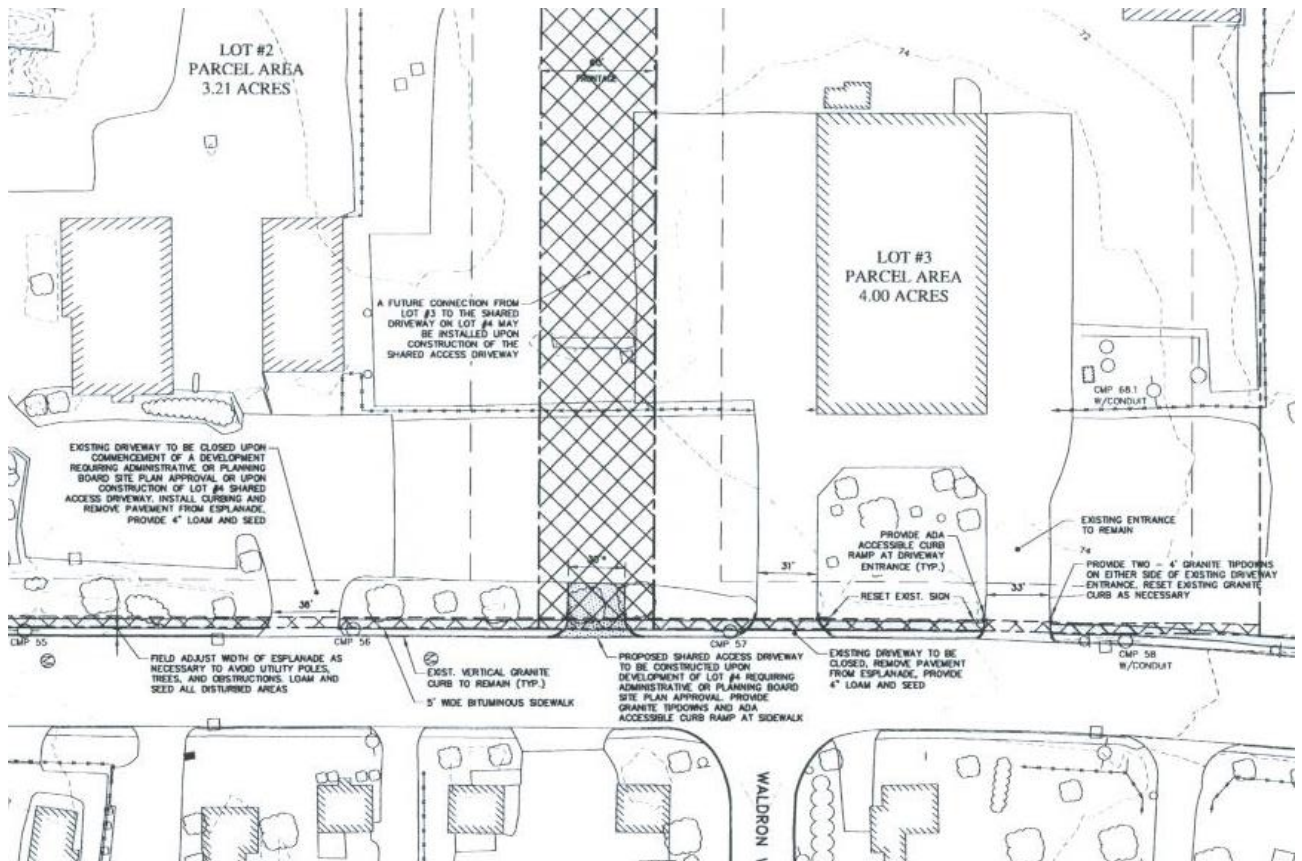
Sidewalk and Driveway Plan, Riverside Subdivision Plat
